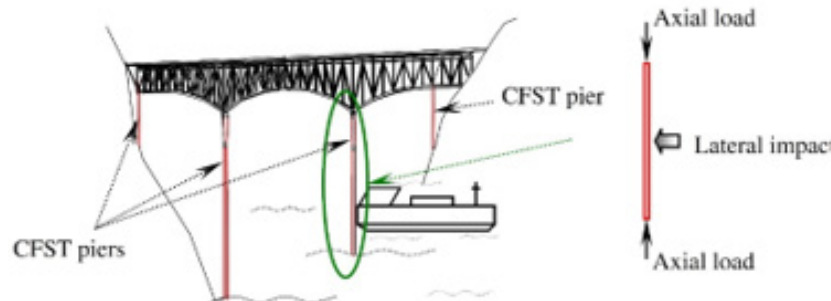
CFST bridge pier subjected to impact load created by a ship by Wang et al. [157].
